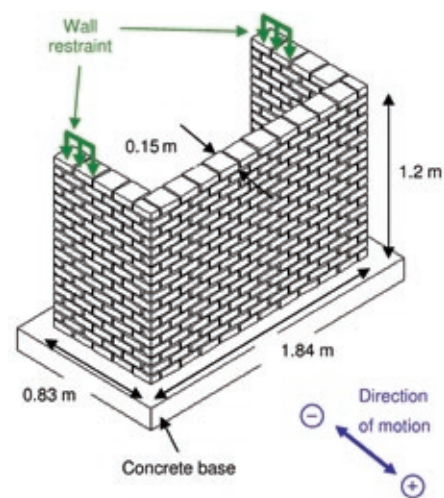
Specimen configuration and dimensions. Wall width = 0.15 m (5.9 in.), except for specimen 3H (= 0.10 m, or 3.9 in.); mortar joints, 12–13 mm (0.5 in.).
